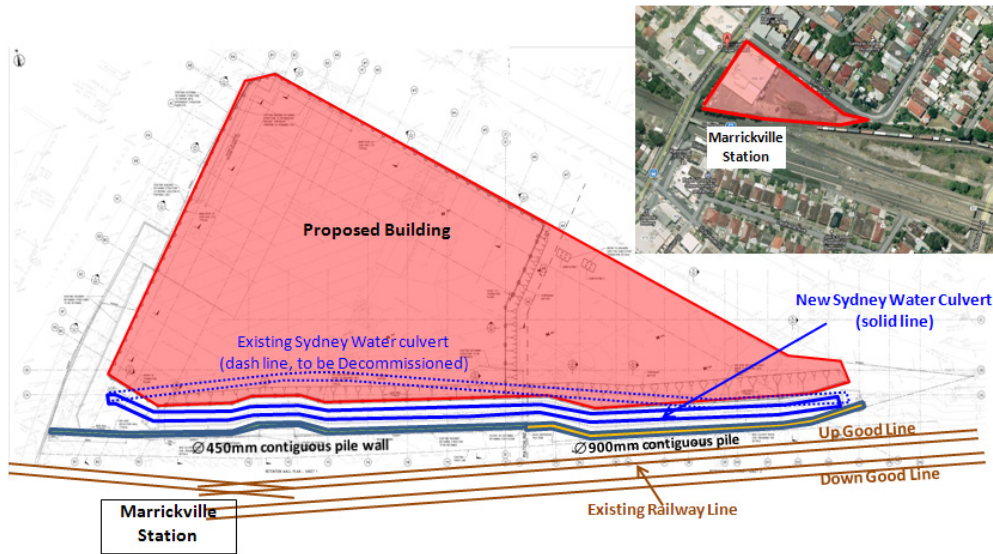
Site Location & Layout (Existing & Proposed Structures)
